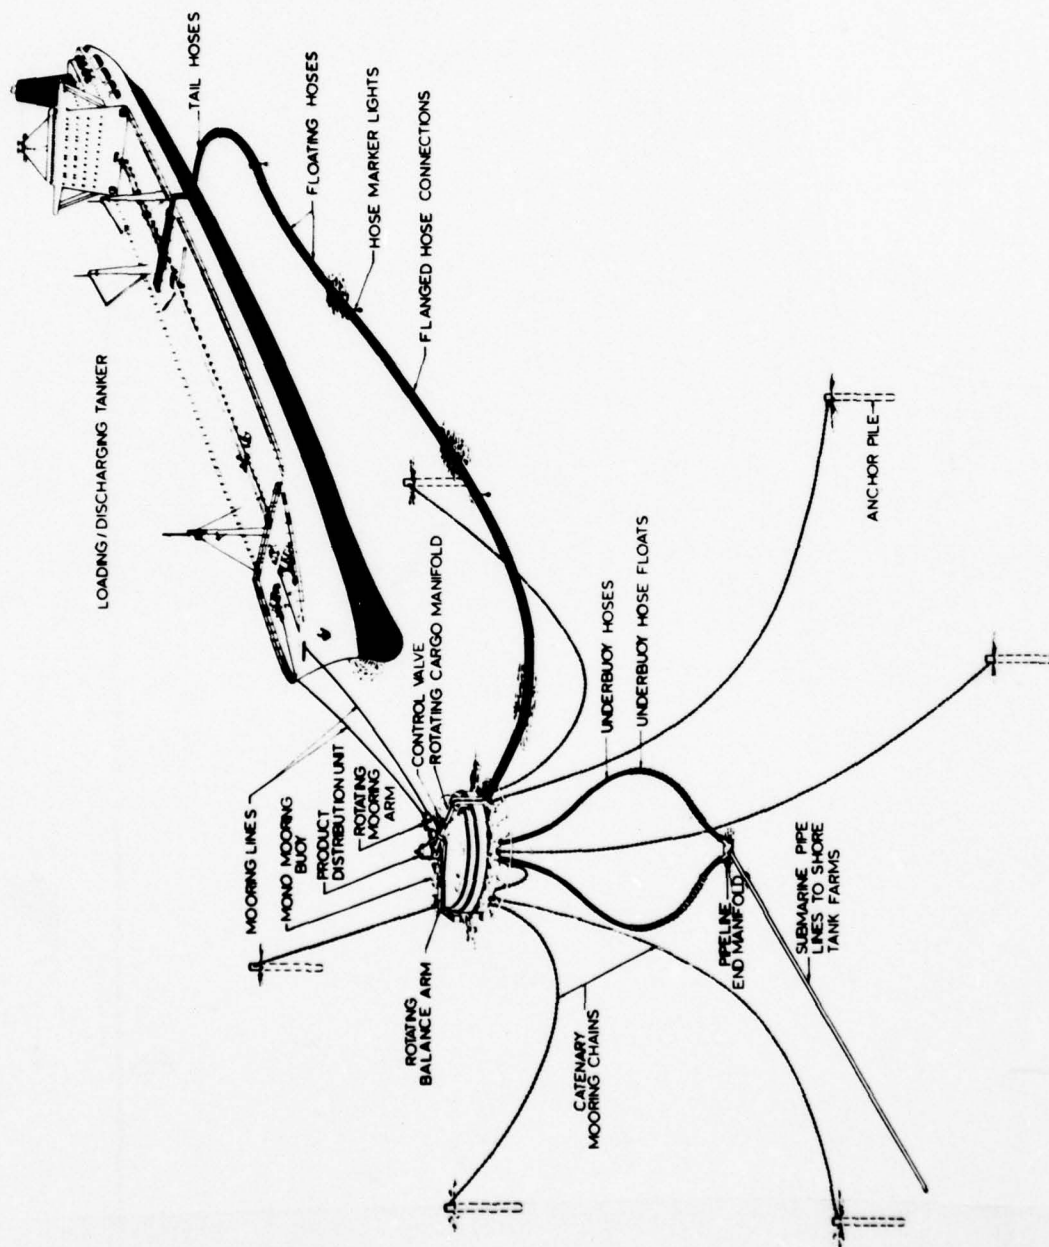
GENERAL ARRANGEMENT OF CATENARY ANCHOR LEG MOORING (CALM)
